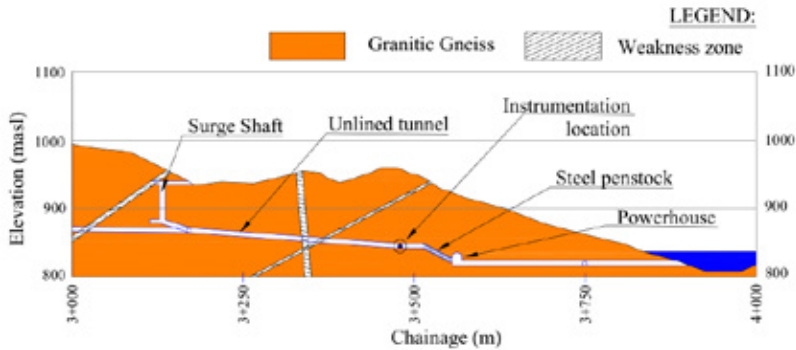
Longitudinal geological section of the downstream segment of the headrace tunnel with instrumentation location and other underground structures.
